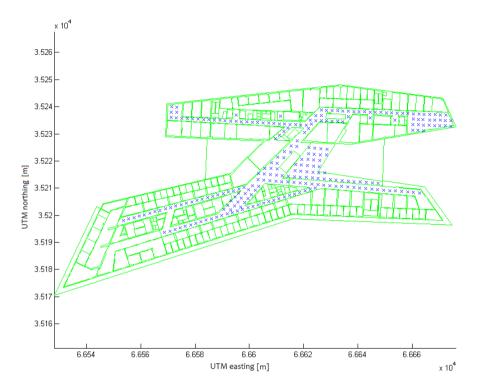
Floor plan with 250 grid points of fourth floor at HCU
